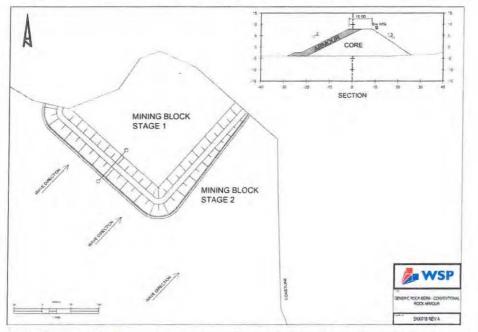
Layout of generic rock berm with conventional statically stable rock armour slope
